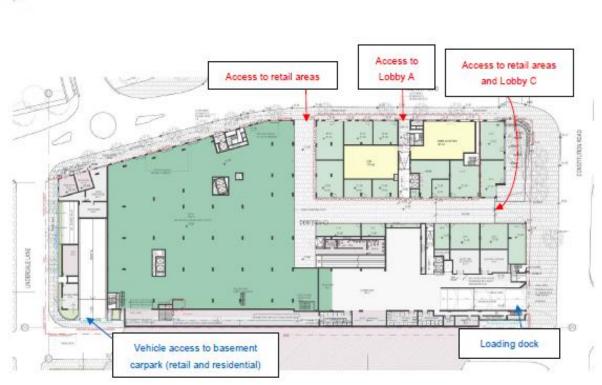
Ground floor plan with pedestrian and vehicle access indicated.
